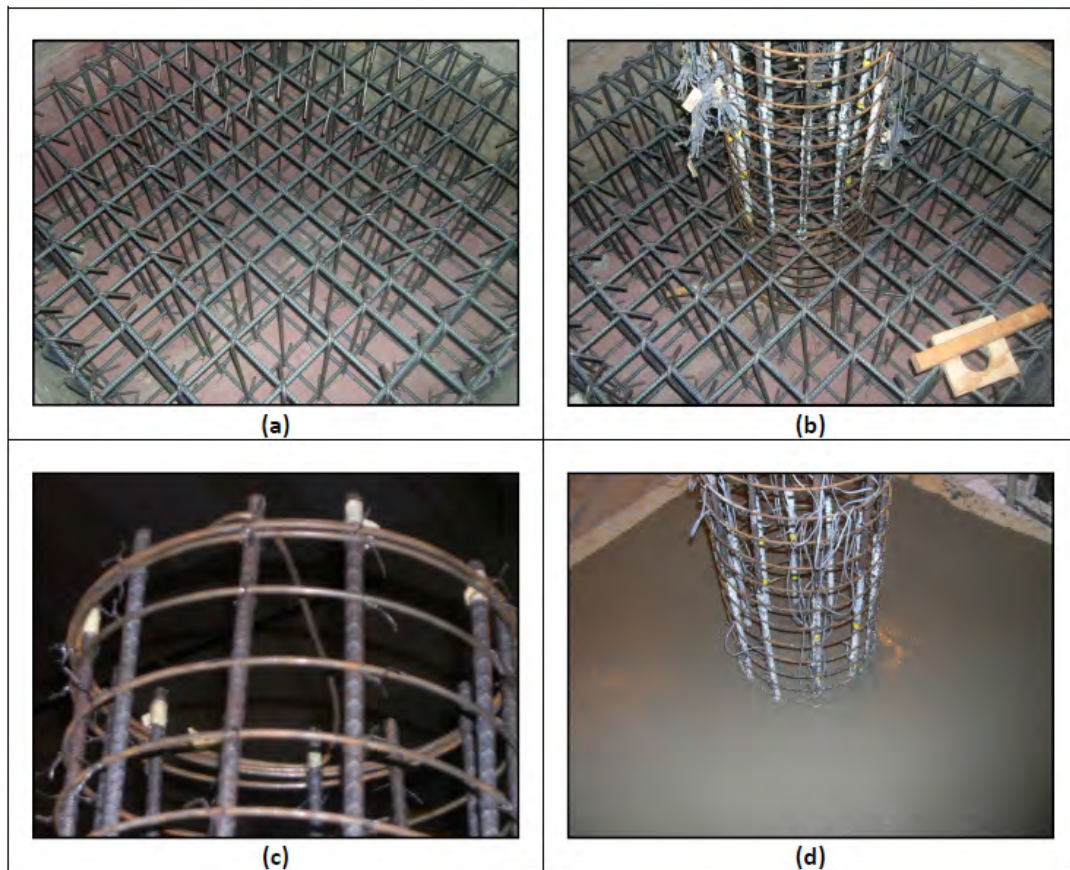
Construction photos of TS-1: (a) foundation reinforcement cage; (b) foundation and column reinforcement cage; (c) close up of top of spiral reinforcement cage; and (d) foundation after casting.
